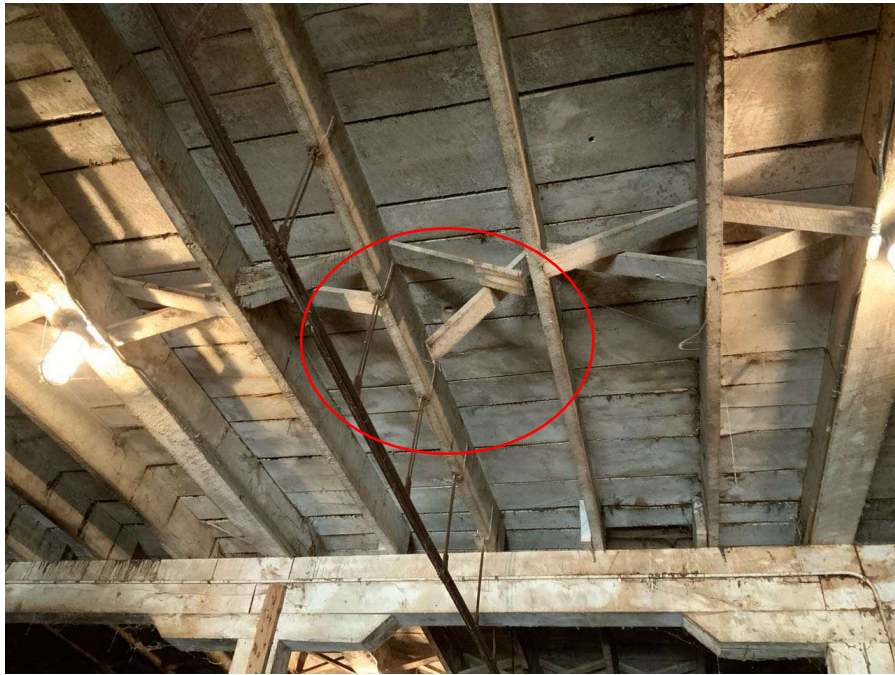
Disconnected member of floor bridging. Bay to the northeast of Column L/5 shown.
